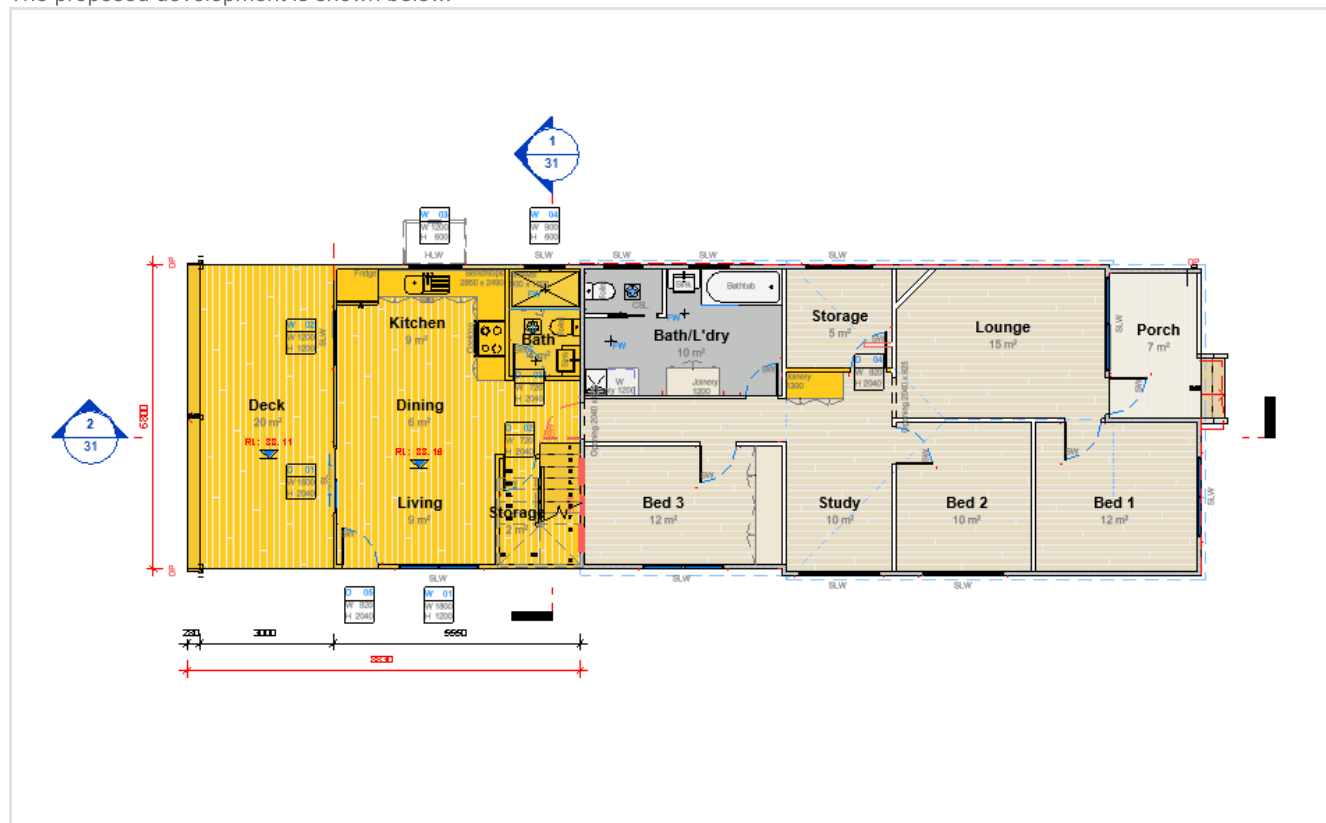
Existing/Demolish/Proposed ground floor plan
